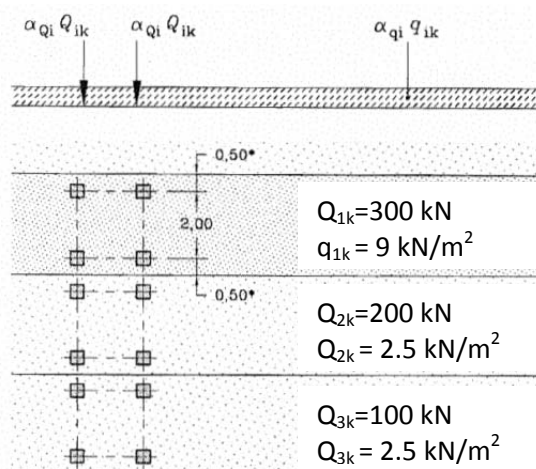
Traffic loads on bridges according to Eurocode EN1991-2, Load Model 1
